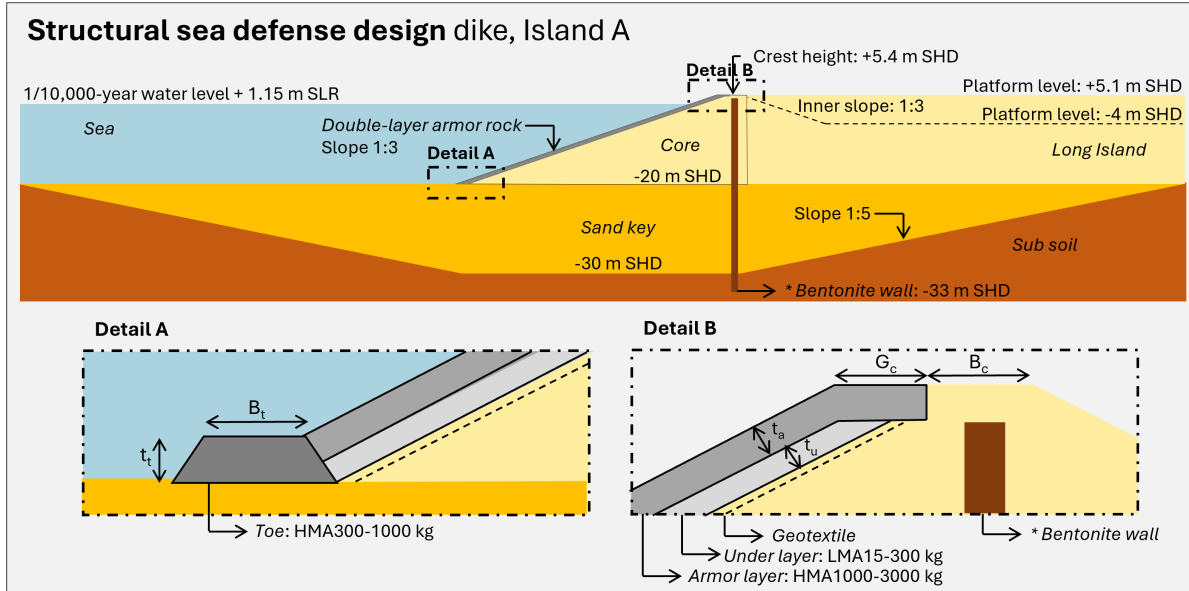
Structural dike design Island A. \*Bentonite wall only applicable for polder reclamations.
